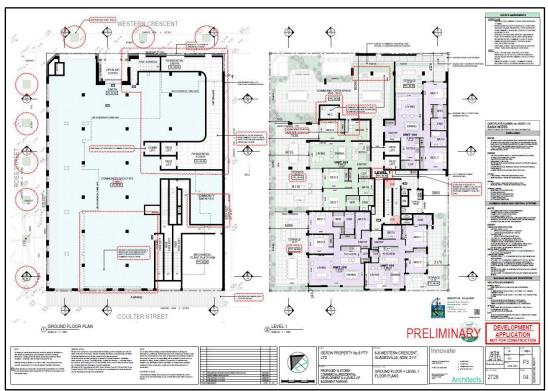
Proposed Ground Floor + Level 1 Floor Plans
